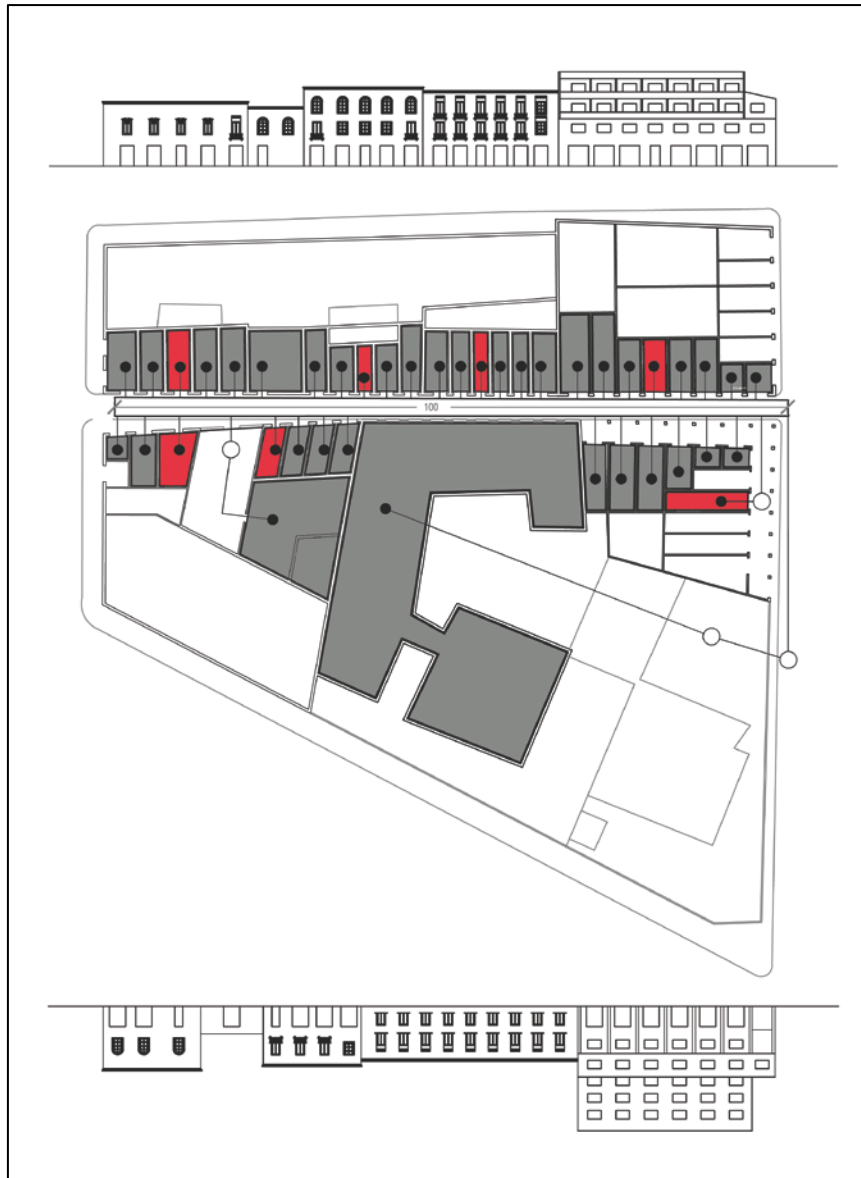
Constitutedness of the ground floor plan on the connecting street of the Italian Quarter
